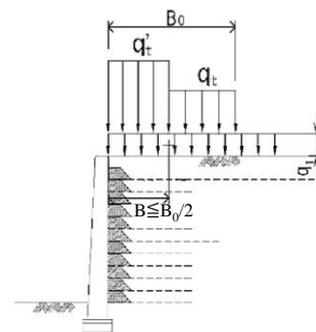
Size and distribution of surcharge (Railroad track is close to the wall face)
